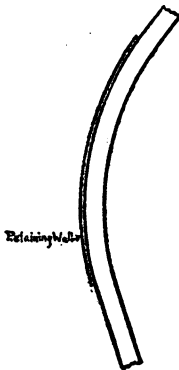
Retaining wall used at sharp curve of concrete-lined ditch.
